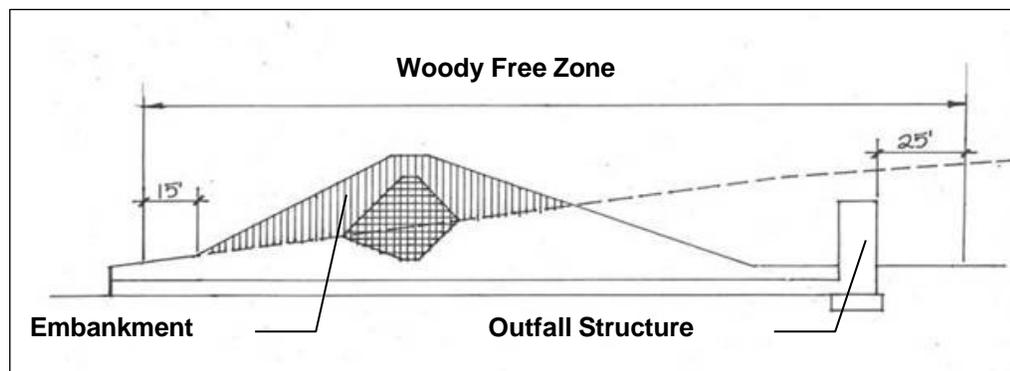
Woody Plant Restriction Area at Code 378 SWM Embankment
